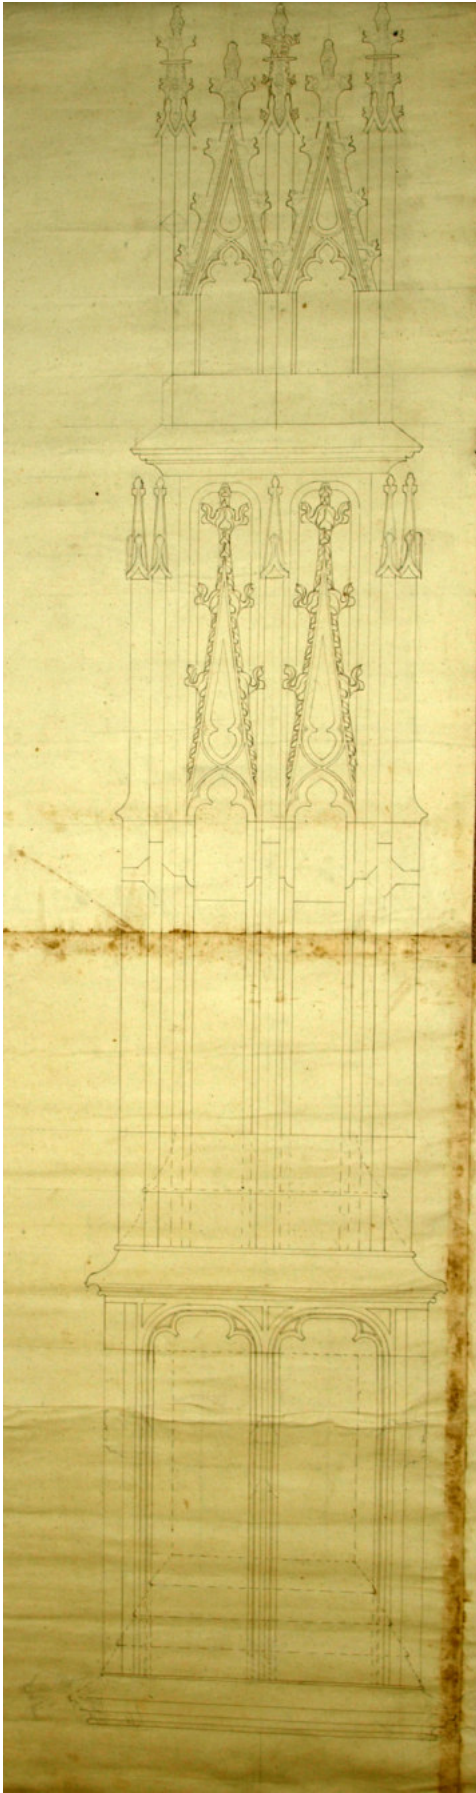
Elevation of the upper section of the north buttress with detail, 1840s (YML/3/11)
